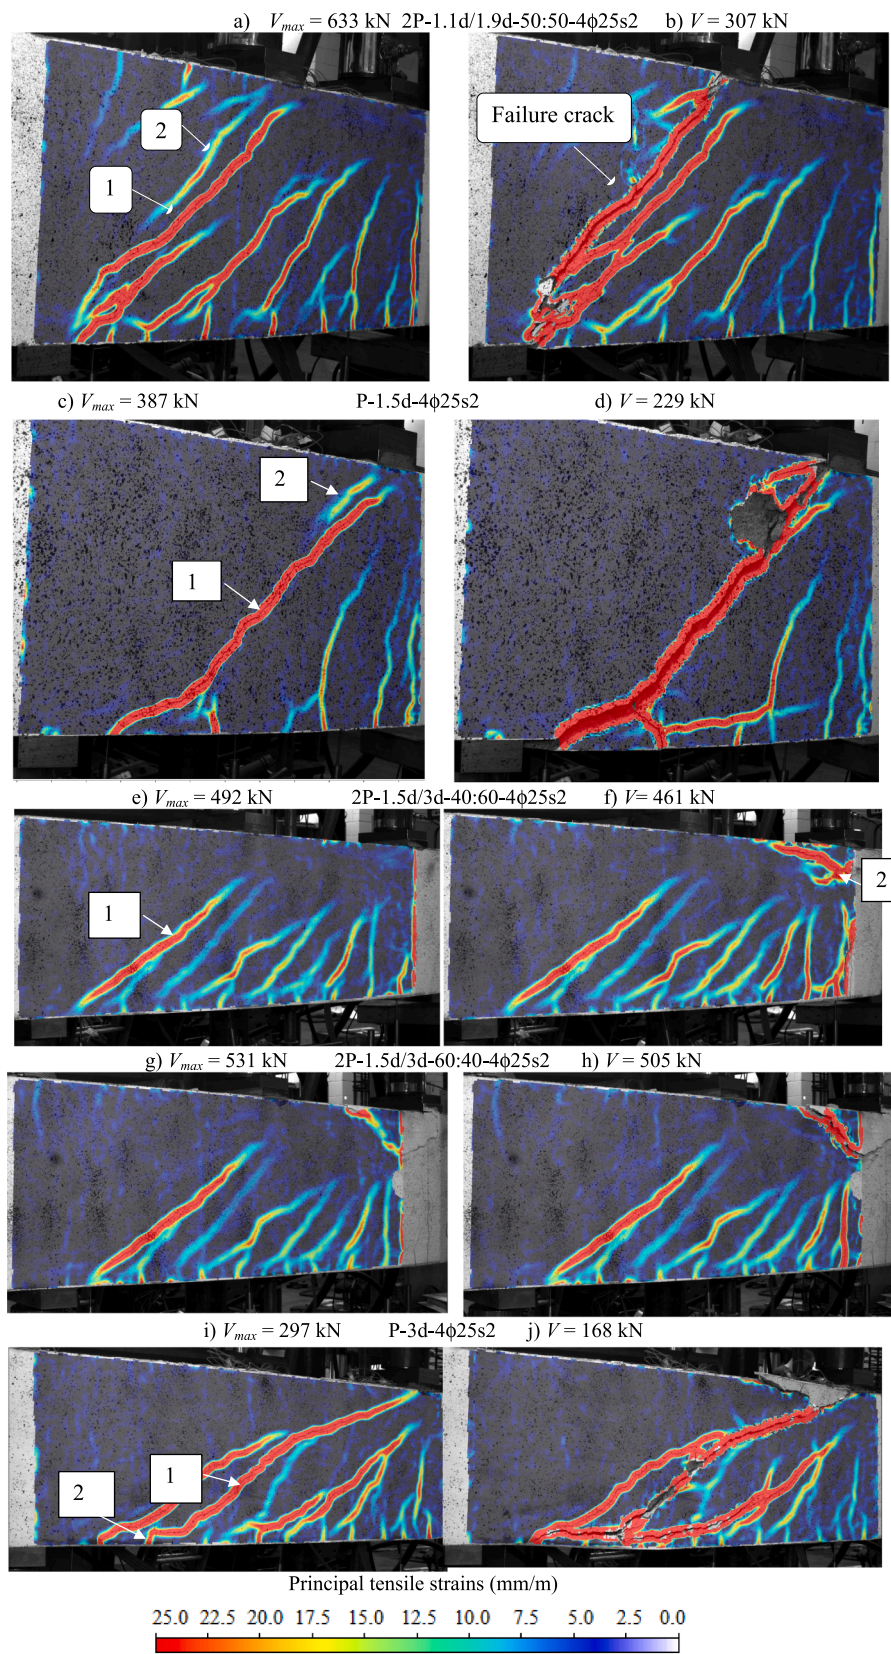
Crack patterns and strain state at peak load and after failure for beams with 8-mm stirrups at 200 mm centres.
